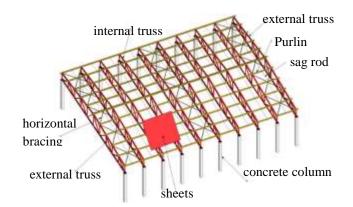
Roof Truss Frame Design of 3D View Structural Plan
